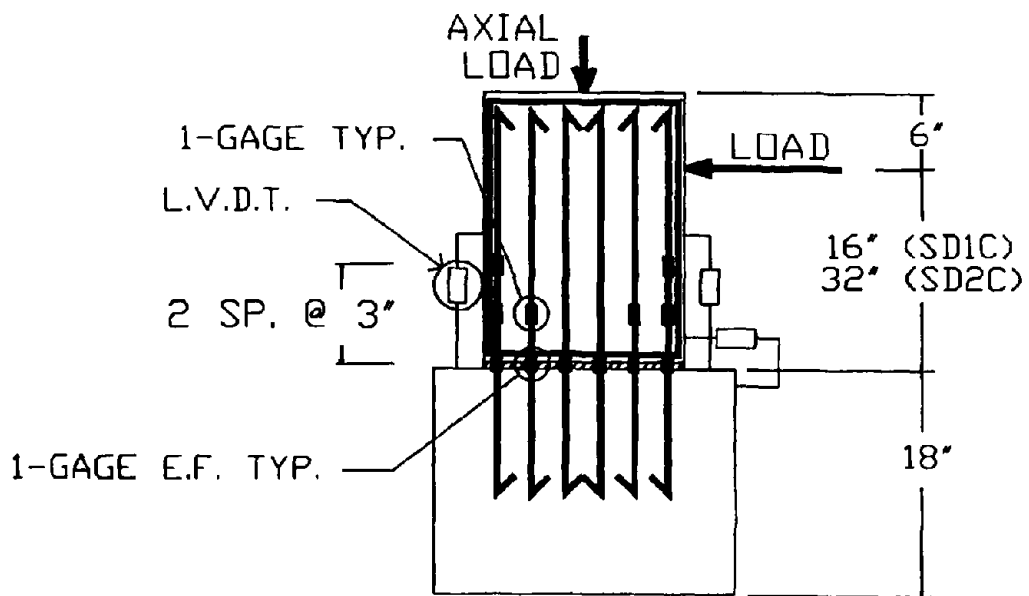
Instrumentation Detail for Specimens SD1C and SD2C.
